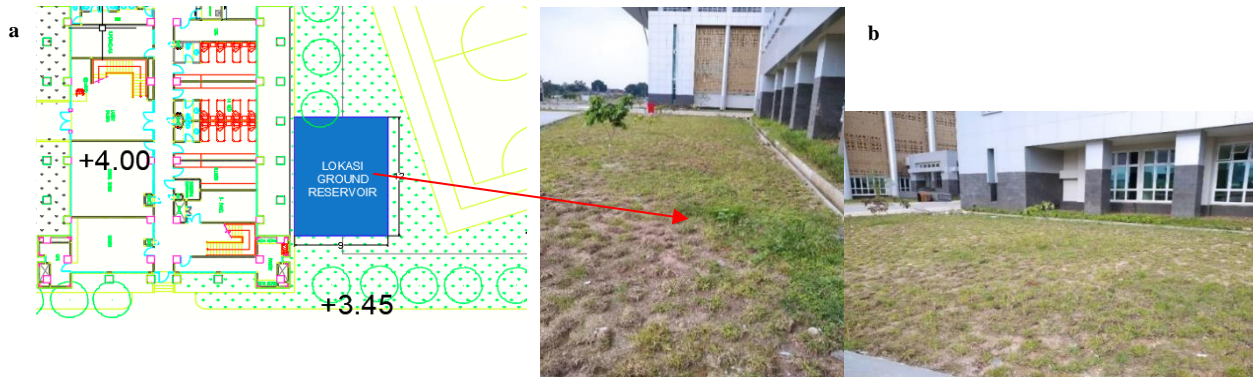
(a) Floor plan; (b) Location of ground reservoir layout.
